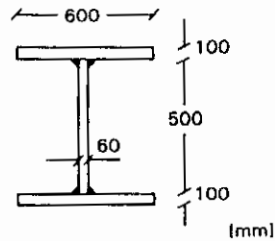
Column cross-section of Example 4.5, welded section.
